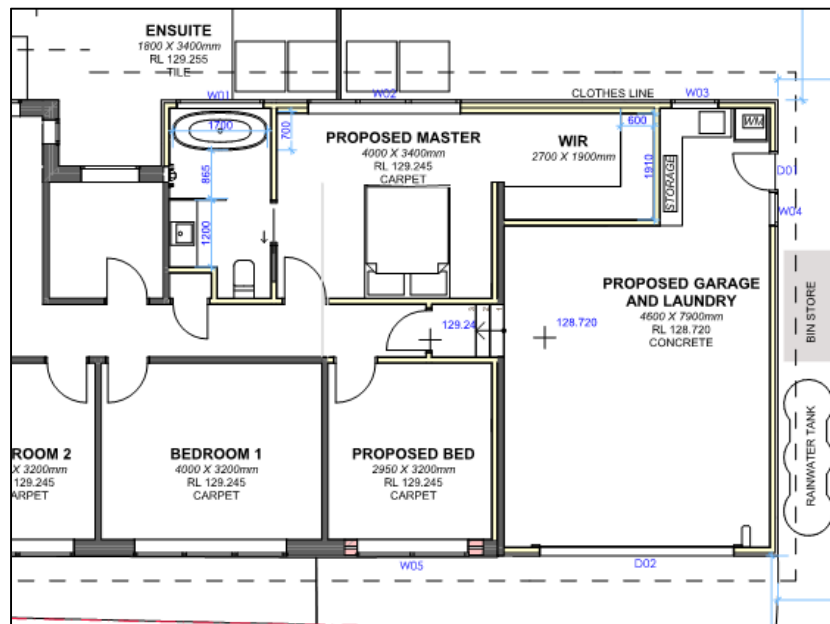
Approved Ground Floor Plan (Excerpt DA04 August 2018 - NTS)
